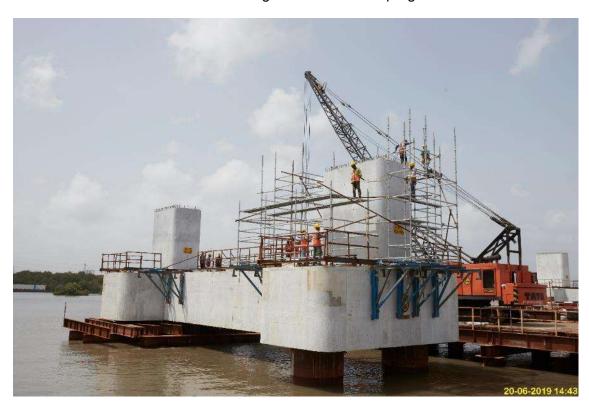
Pile Cap & Pier Works at MP6 in progress
